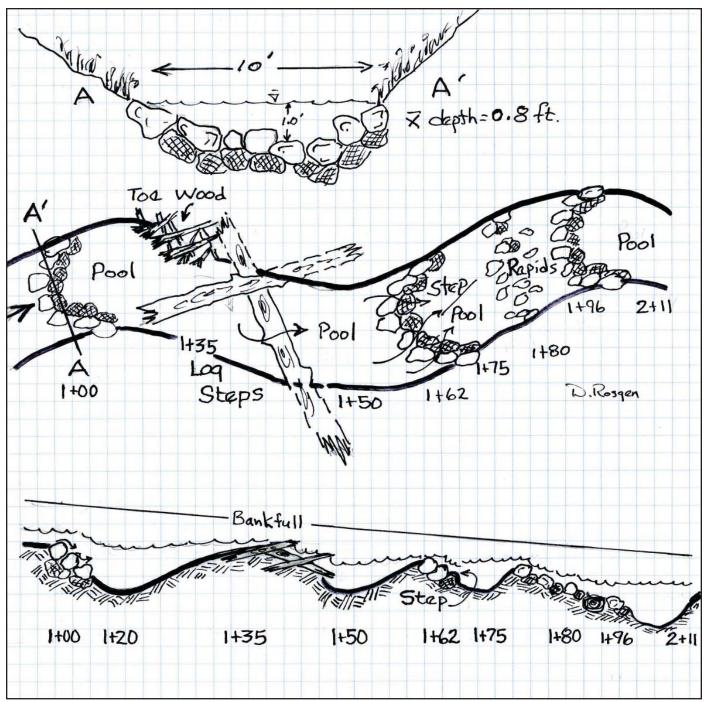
Typical cross-section, plan and profile views of the proposed B2 stream type and associated structures.
